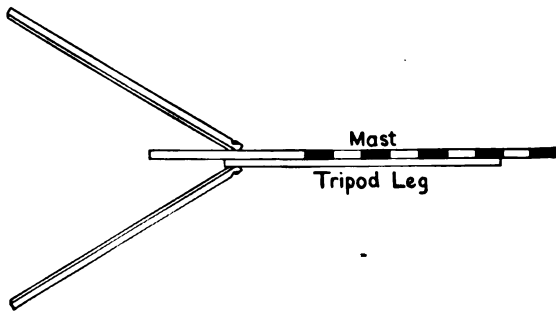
PLAN OF TRIPOD SIGNAL BEFORE BEING RAISED.
